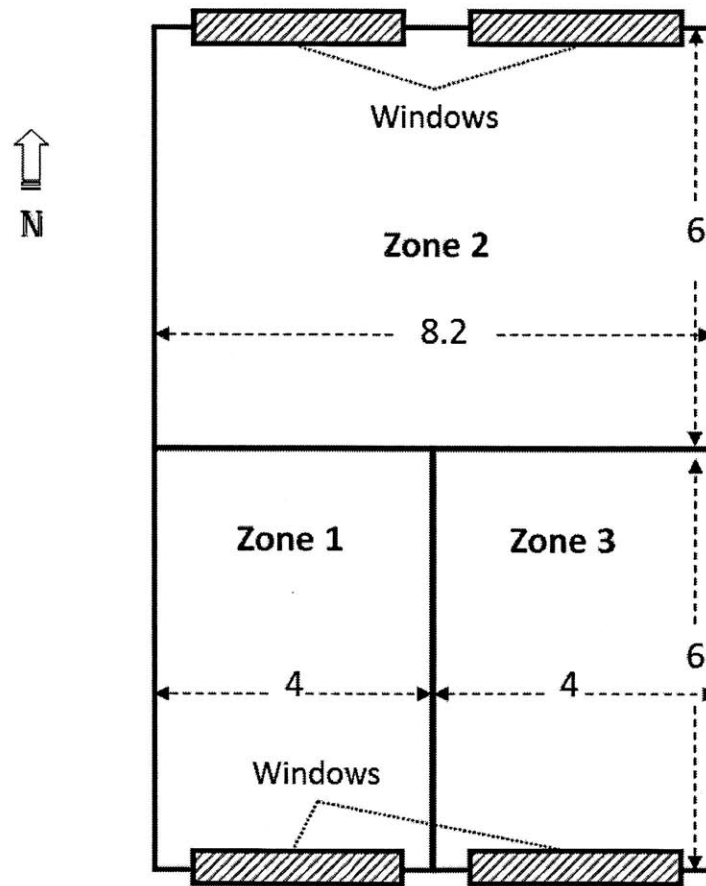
Floor plan for configuration with three zones. All dimensions in metres.
